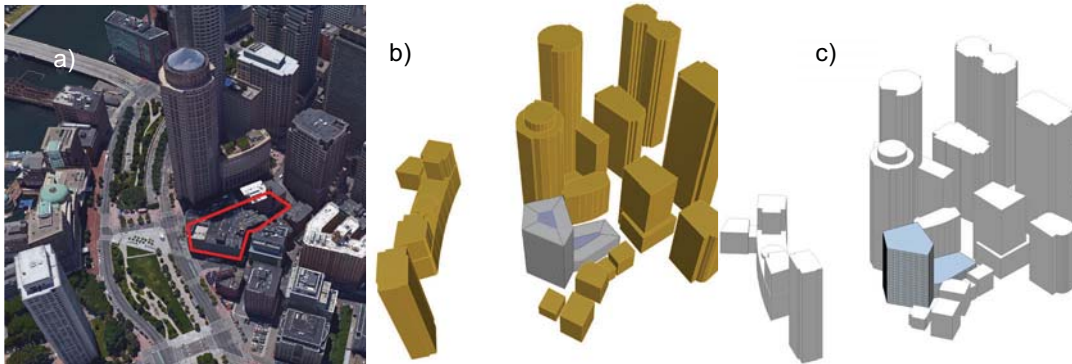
a) Case study building site outlined in red; b) Rhino model of the case study building, with surrounding buildings; and c) Revit model of the case study building, with surrounding buildings. Source: (Author 2017)
